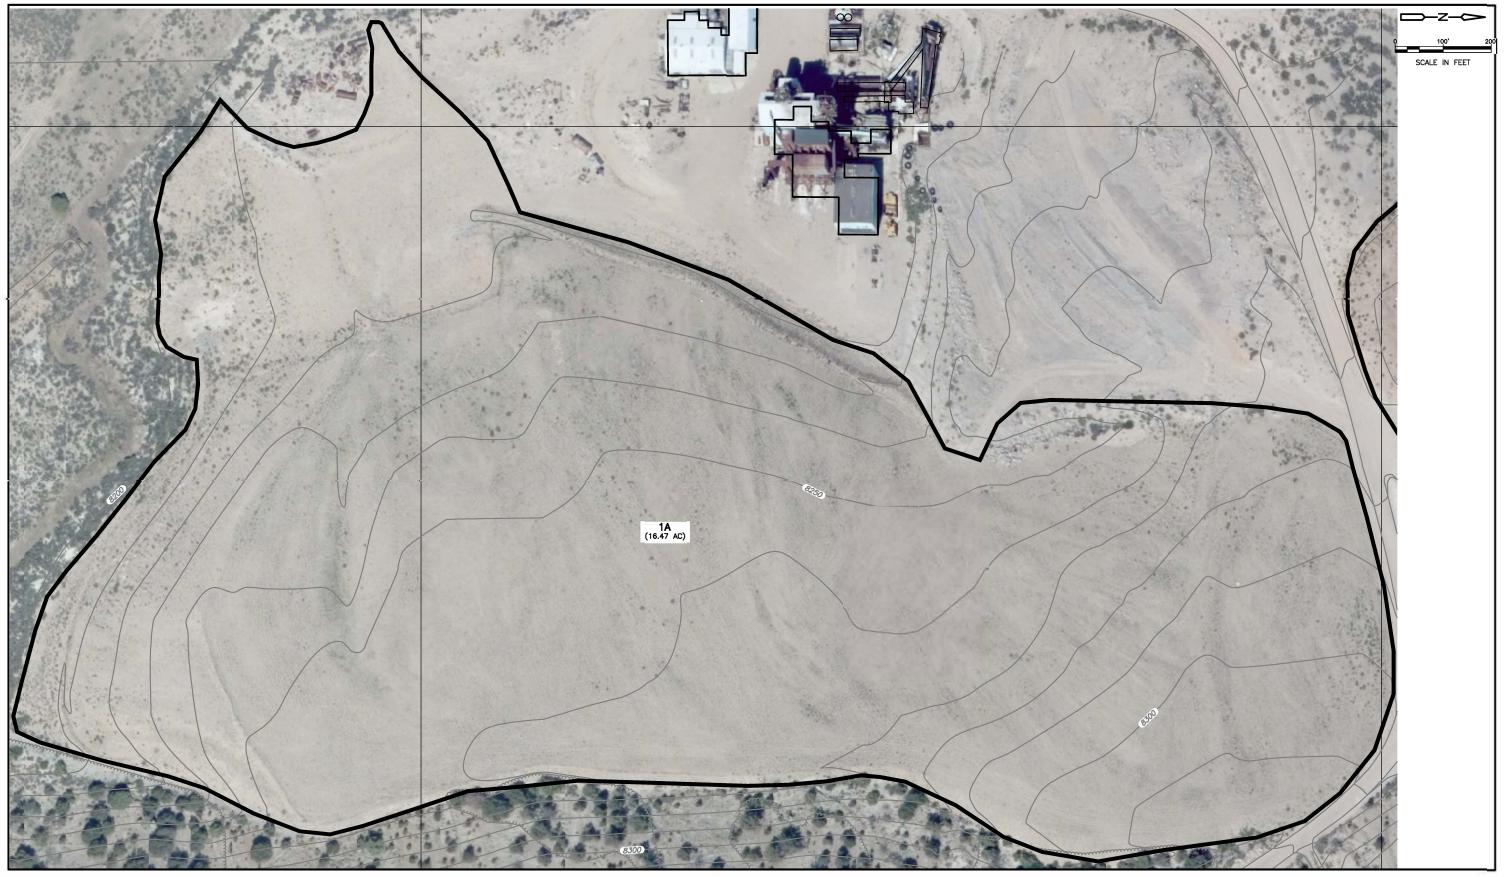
AREA 1A ENLARGED SITE PLAN August 2018
